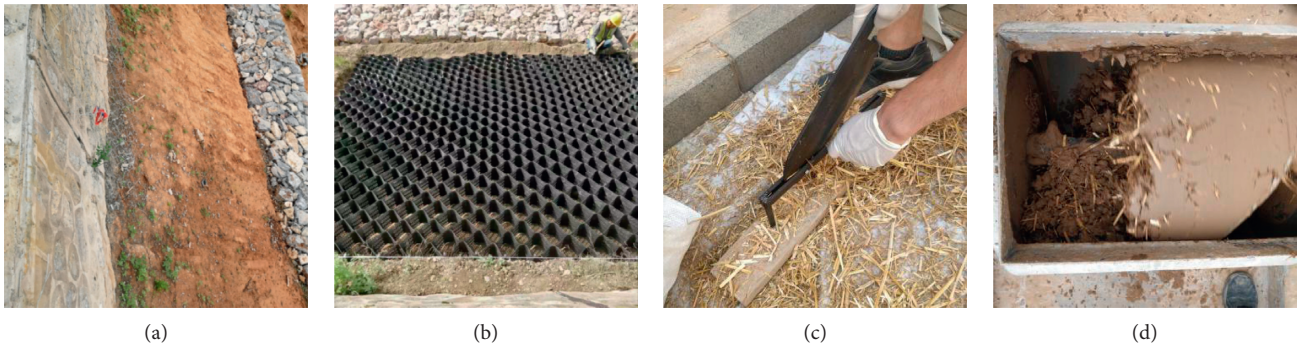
Modelling material preparation: (a) planting soil in the field; (b) geocell structures; (c) wheat straw cutting; (d) mixture of straw with the planting soil.
